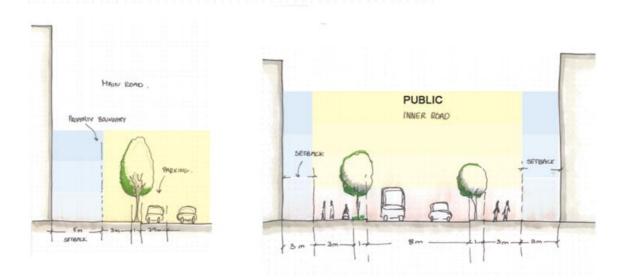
Proposed streetscape of main road (left) and secondary/ inner road (right) (Al Wastani and the Future Urbanization of Saida Workshop, 2014)
